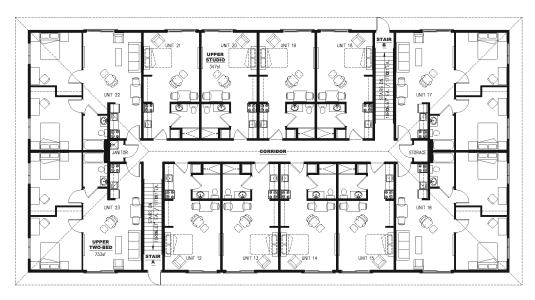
Staff Housing Expansion Apartment Floor Plan
